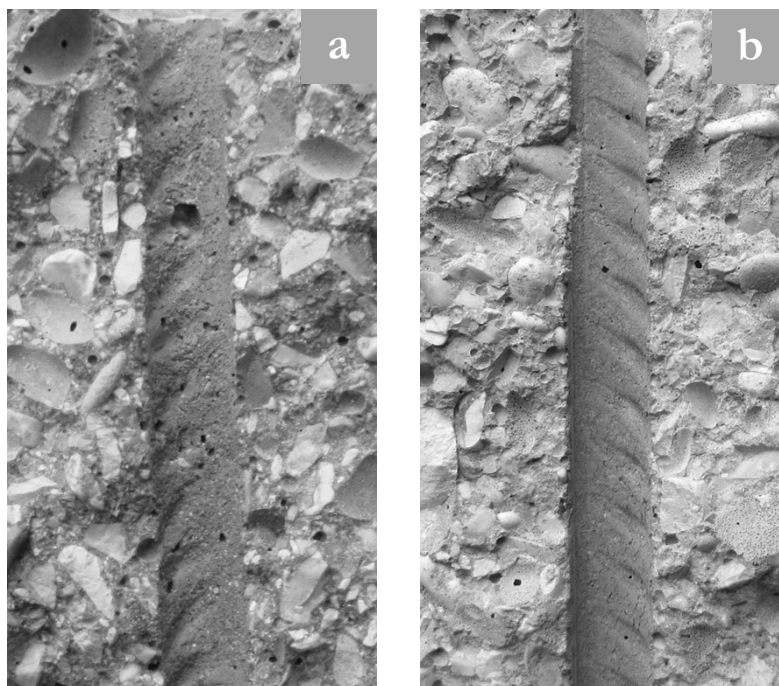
Cross-section through separated test specimens made of grey concrete without inhibitor (a) and with 3 % NO_2^- (b) after removal of the galvanized steel bars
